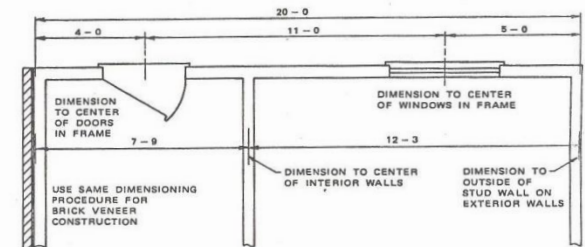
Recommended method of dimensioning frame wall construction.
